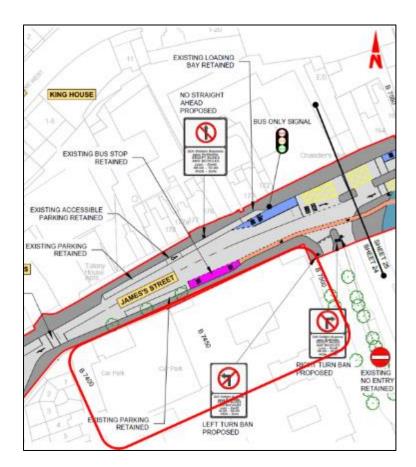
Proposed new Layout at St. James's Hospital Access
